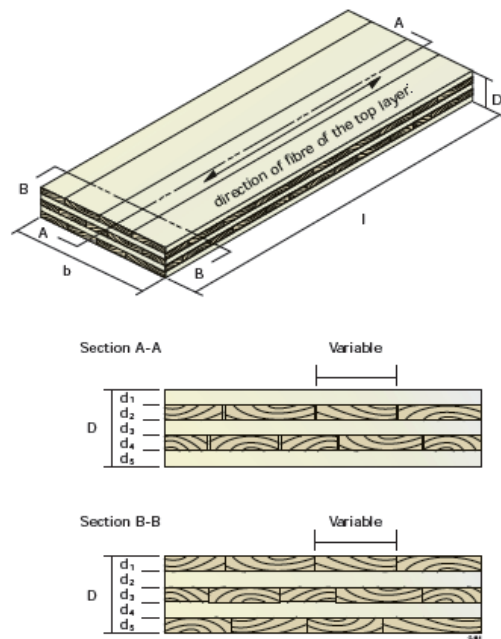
Typical CLT Panel Cross-Sections (FPInnovations, 2011)
